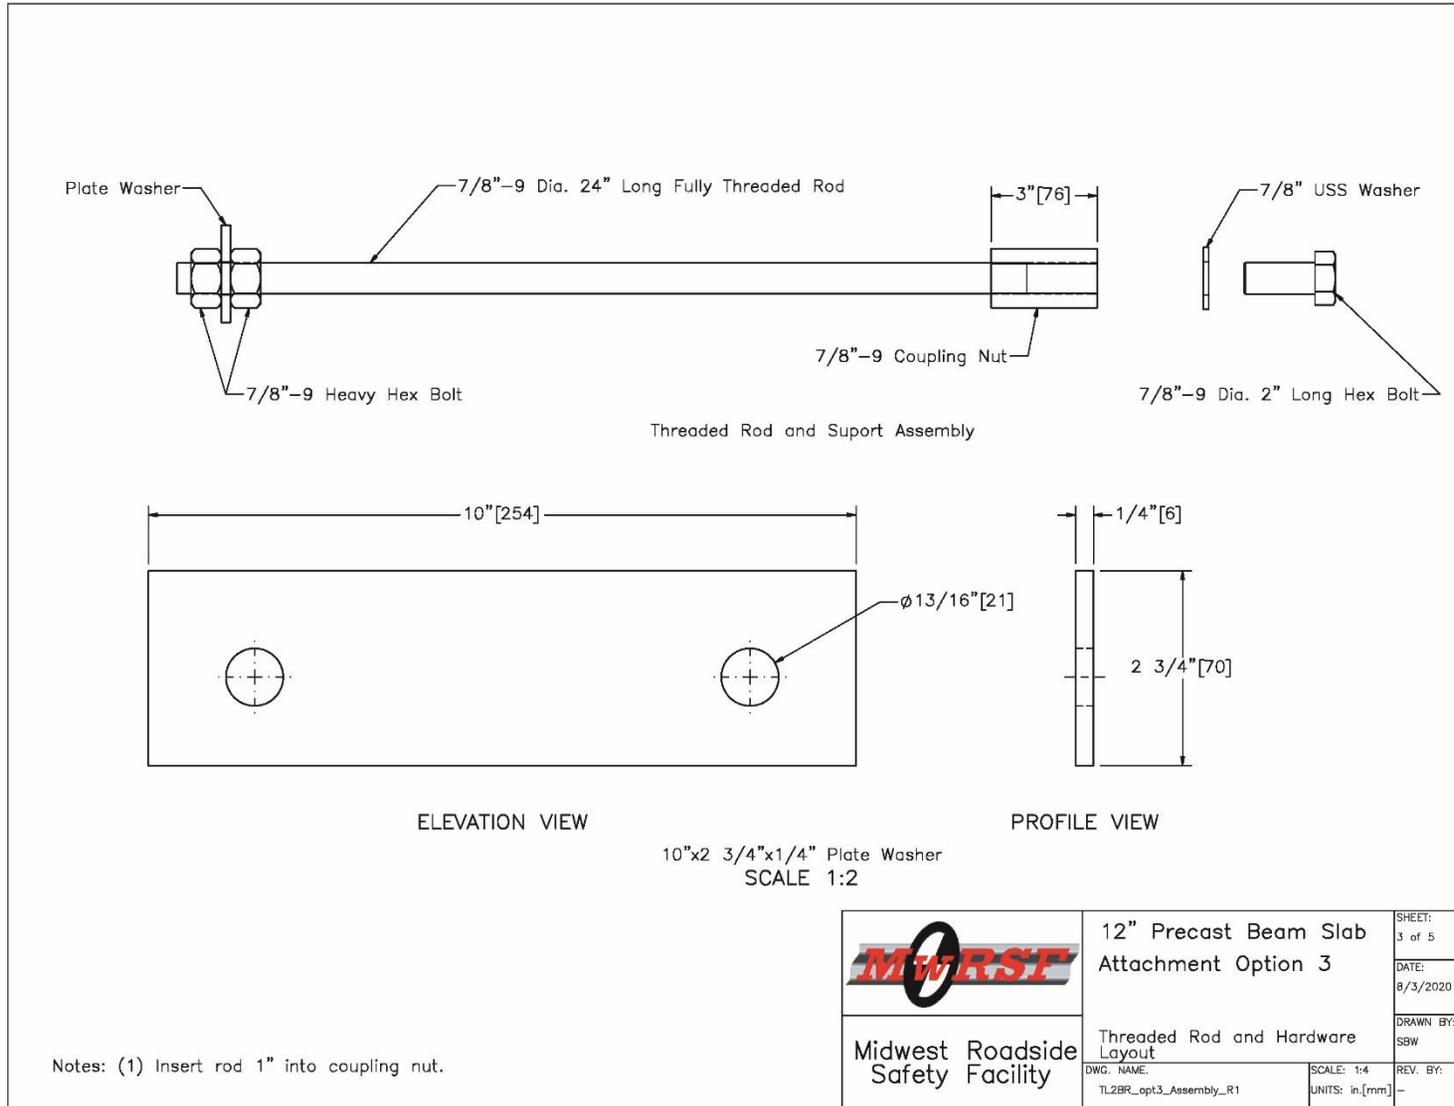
System Details, TL-2 Bridge Rail Attachment to 12-in. Deck, Option 3, Embedded Anchorage
